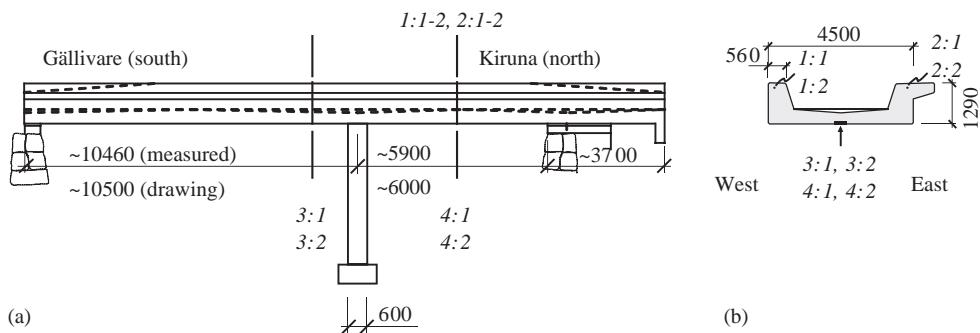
Bridge over Luossajokk in Kiruna in northern Sweden; a) elevation and b) cross section with location of strain gauges.
